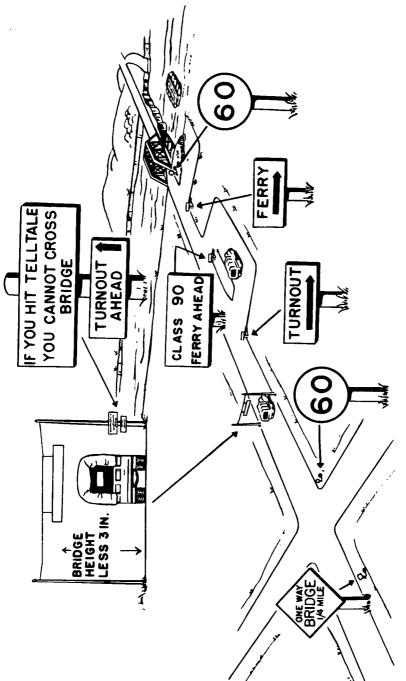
Typical arrangement of road-guide, information, single-lane bridgeclass signs.
